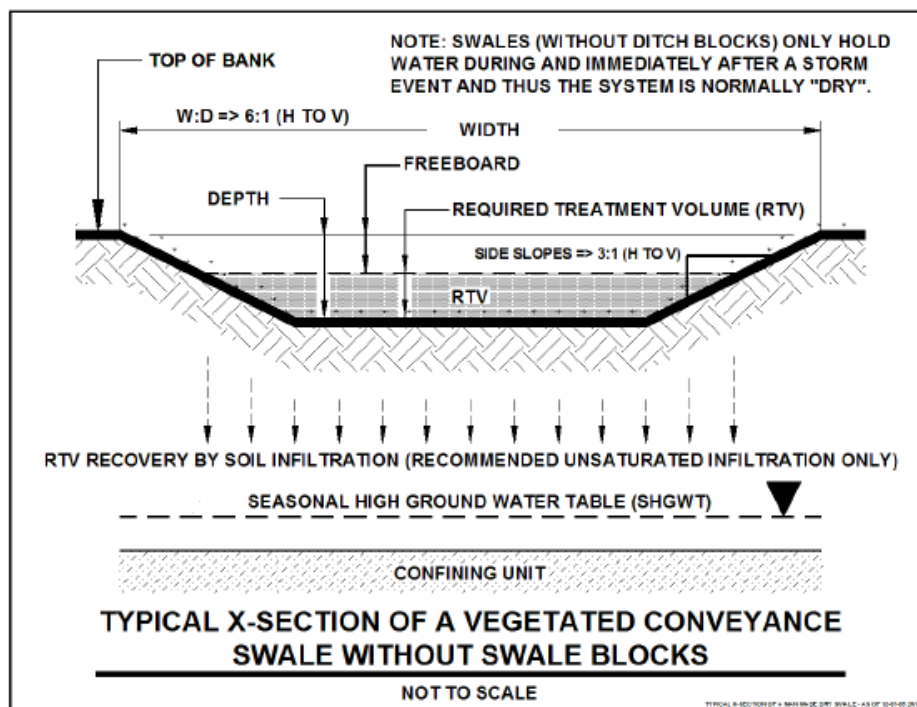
Typical Cross-section of a Vegetated Conveyance Swale without Swale Blocks
